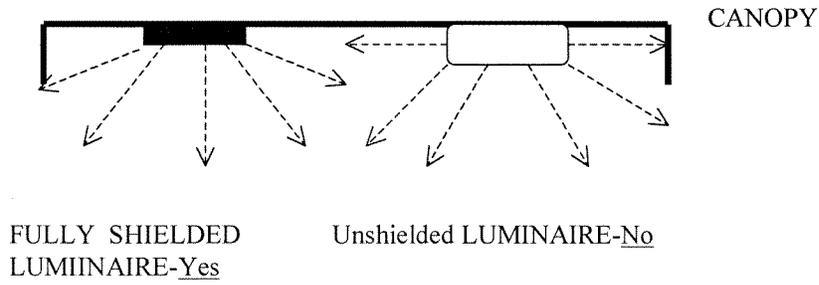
Building canopies, overhangs, roof eaves and similar types of construction shall not be considered as the means for providing the light cutoff. The cutoff characteristics shall be achieved by the LUMINAIRE itself.
